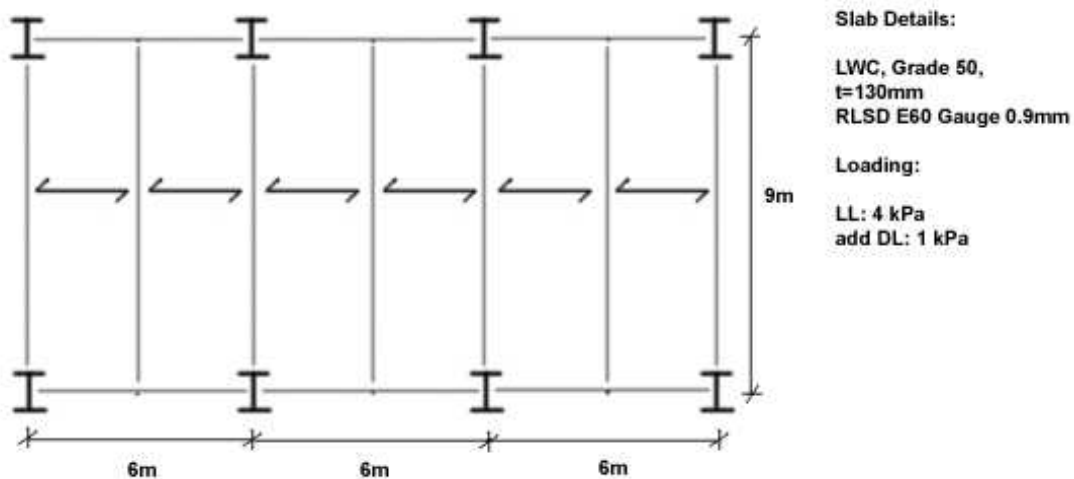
Example 1: Dimensions of a typical bay, details of and loading of slab
